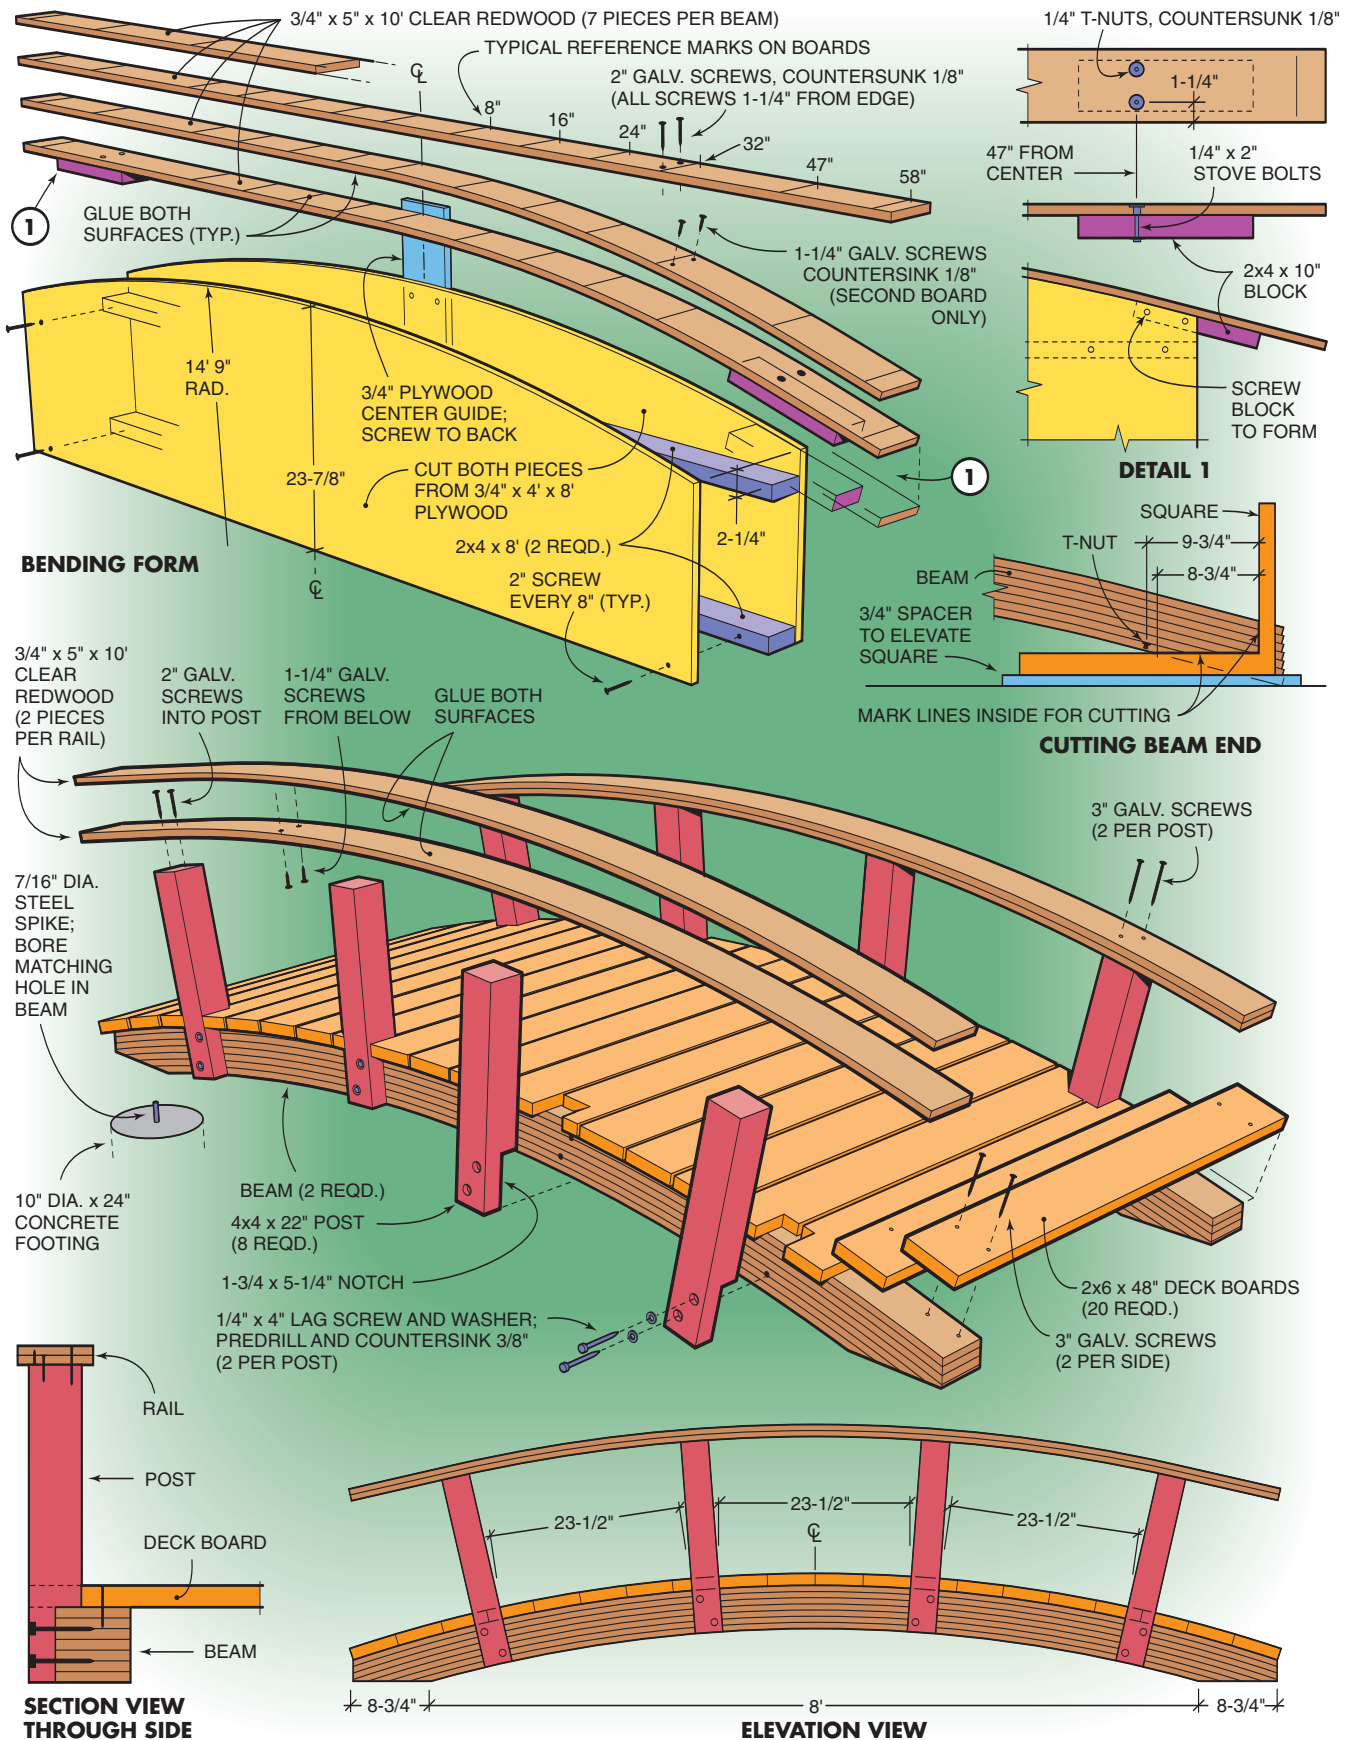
FIG. A WOODEN BRIDGE FORM AND STRUCTURE
